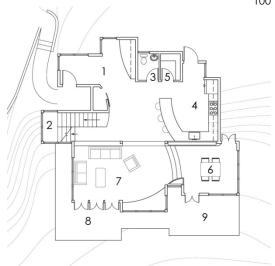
First Floor Plan - 1. Entry 2. Stairs 3. Powder Room 4. Kitchen 5. Pantry 6. Dining 7. Living 8. Deck 9. Outdoor Dining
